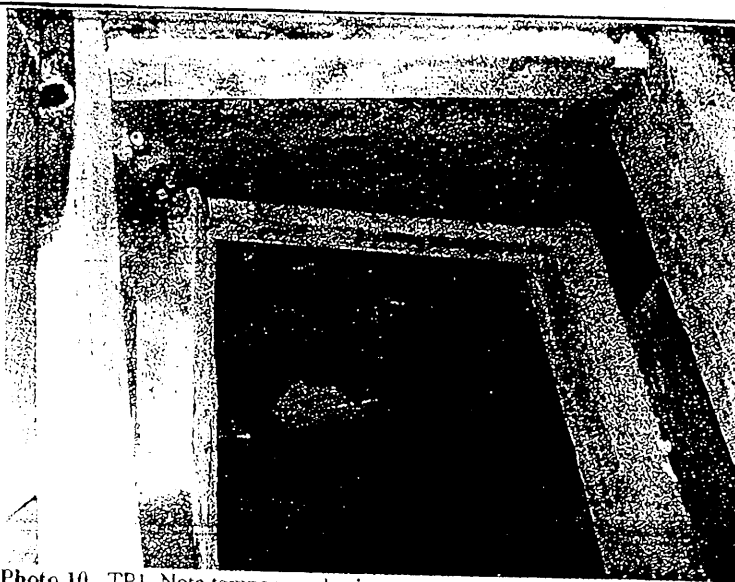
TP1. Note temporary shoring to support loose boulder foundation.
